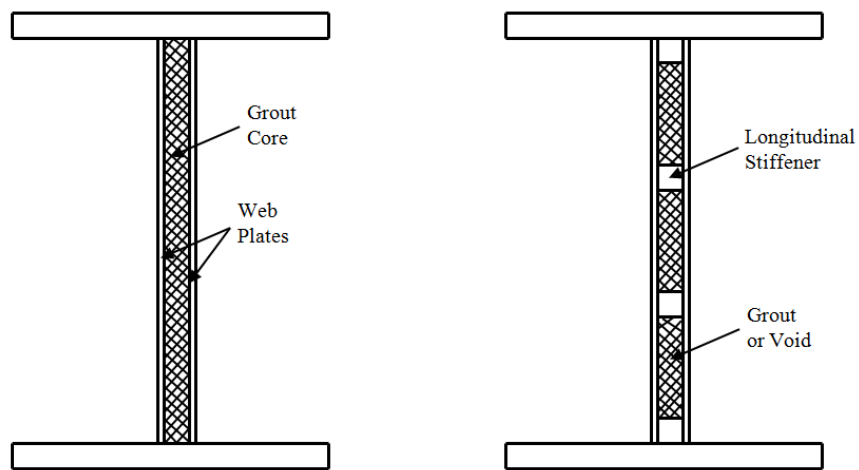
Proposed Sandwich Web Systems in HPS Girders
